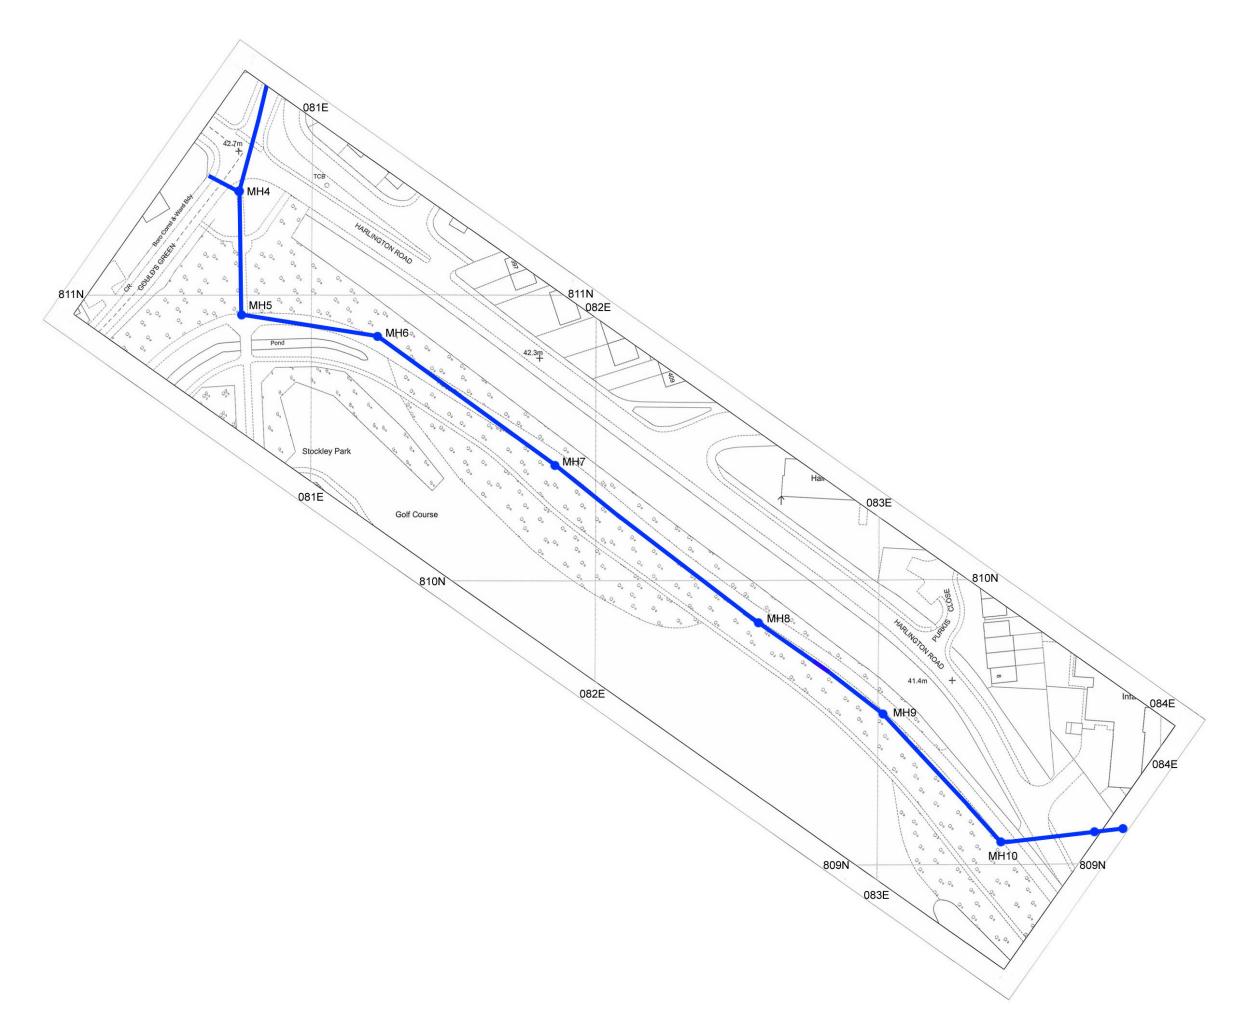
Site plan showing the position of the manholes and the new pipe trench in relation to the current OS map.
